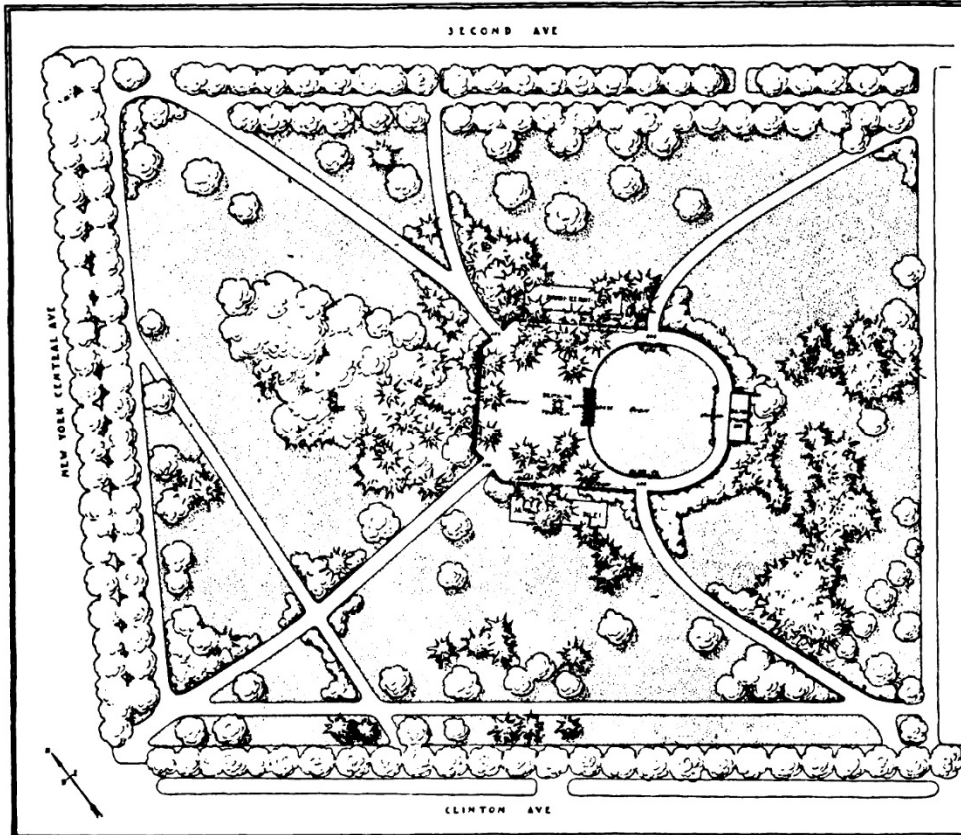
Sketch Plan for Open-air Theatre and Band Stand, Swinburne Park
